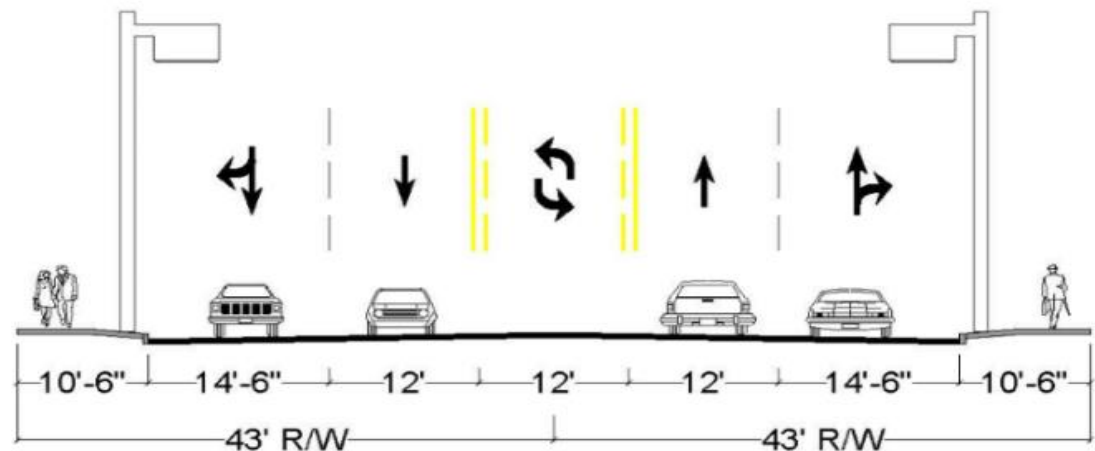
b: Warrensville Center Road existing cross section at signalized intersections
